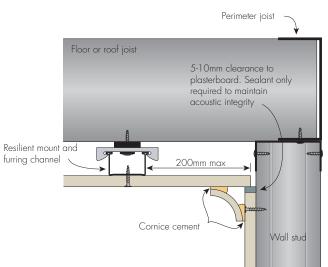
Ceiling to Wall Resilient mount and furring channel
